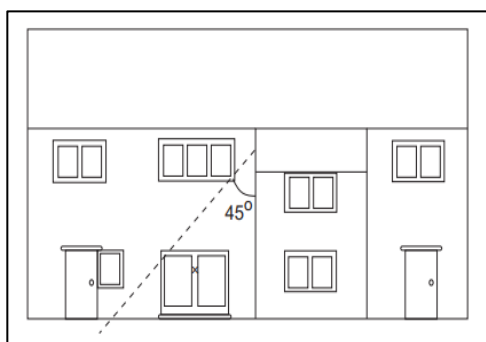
Stage 2 Elevation - 45° guideline assessment. In this example the impacted patio door is within the 45° angle on both plan (fig 1) and elevation, so a significant reduction of light is likely.
